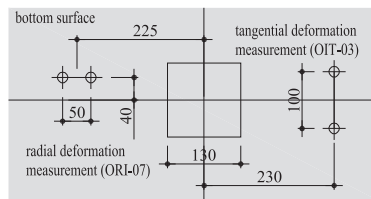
Location of the surface deformation measurements (dimensions in mm)
